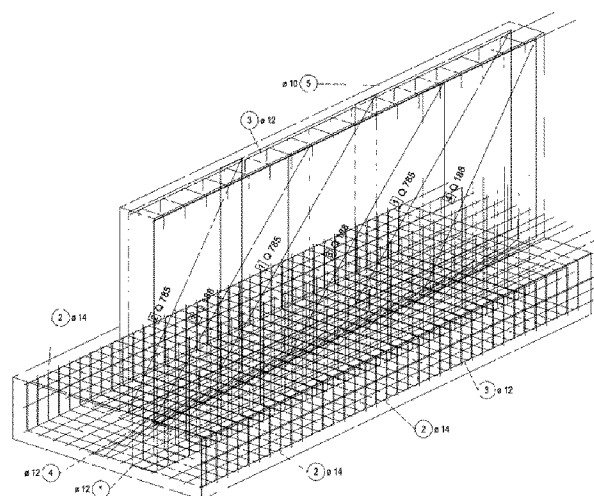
3D BIM model of reinforcement plan of the concrete pile cap and wall of zone I for landslide Laz 18 created in Allplan (Allplan Nemetscheck Group GmbH 2020).
